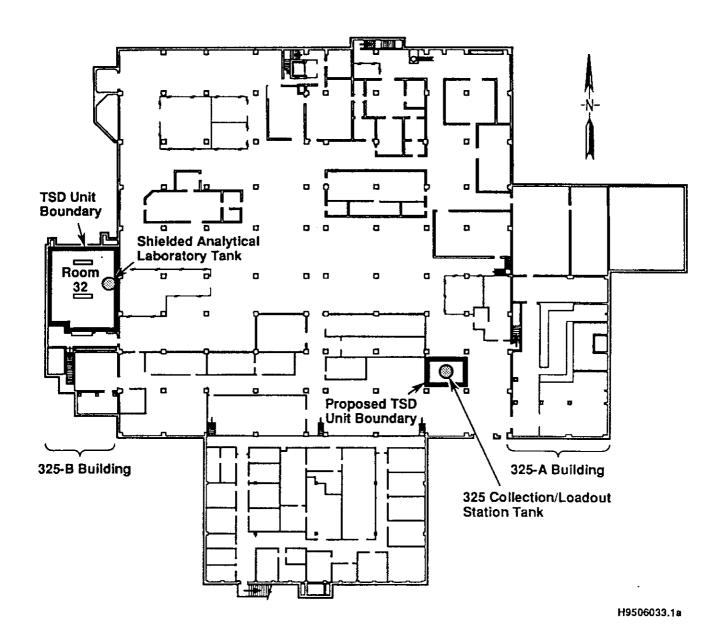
Location of Shielded Analytical Laboratory Tank in Room 32 and Proposed Location of 325 Collection/Loadout Station Tank (basement) of the 325 Building.
